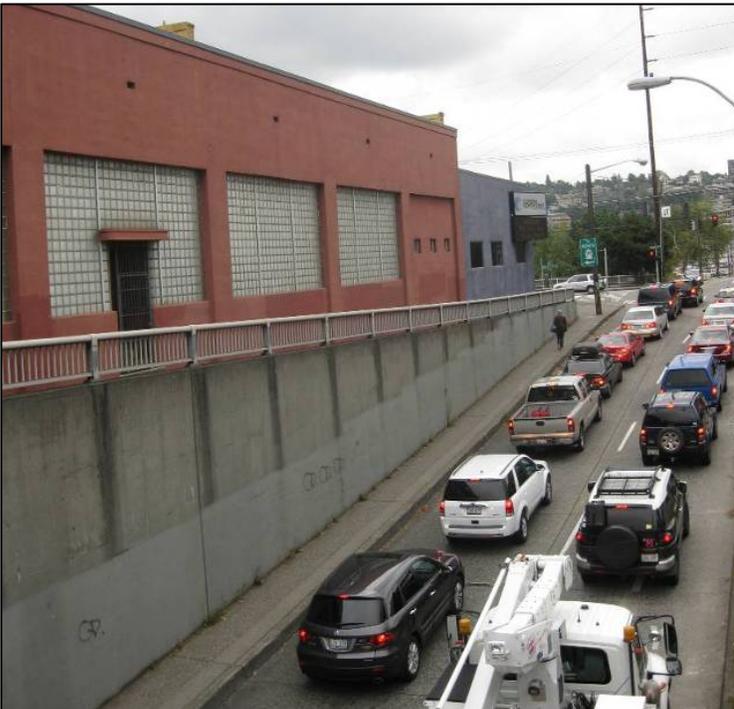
Existing view of Mercer Street, looking east, from the SR 99 bridge over Mercer Street deck.
